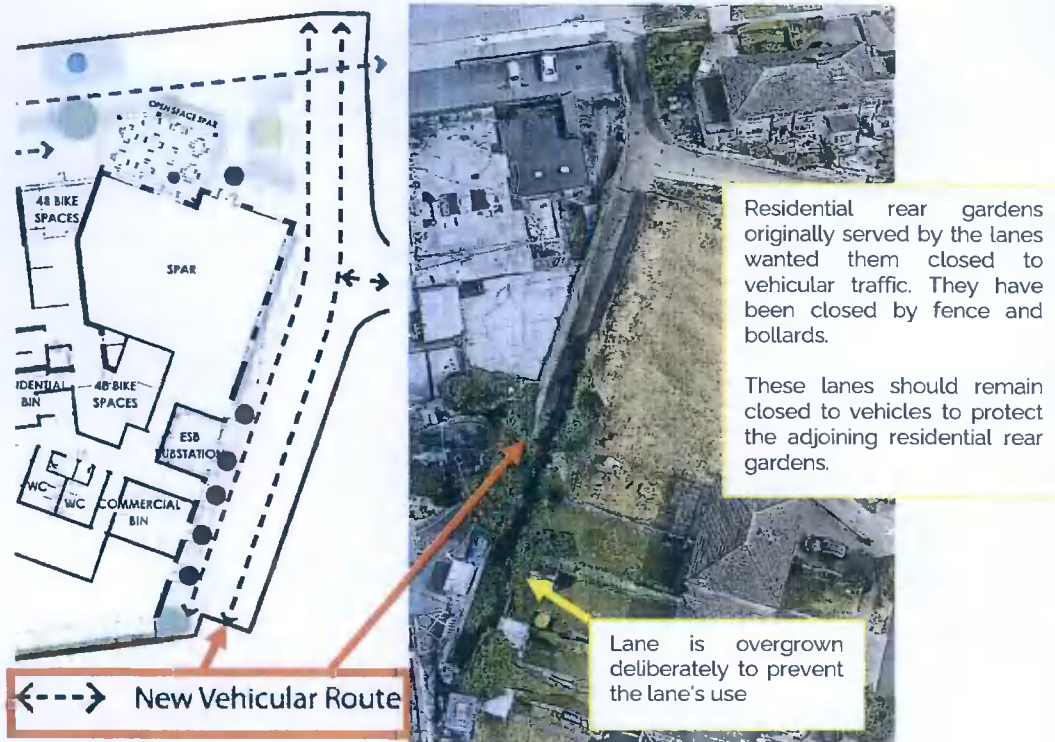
Applicant proposal to open the lanes to the east to traffic is not acceptable
